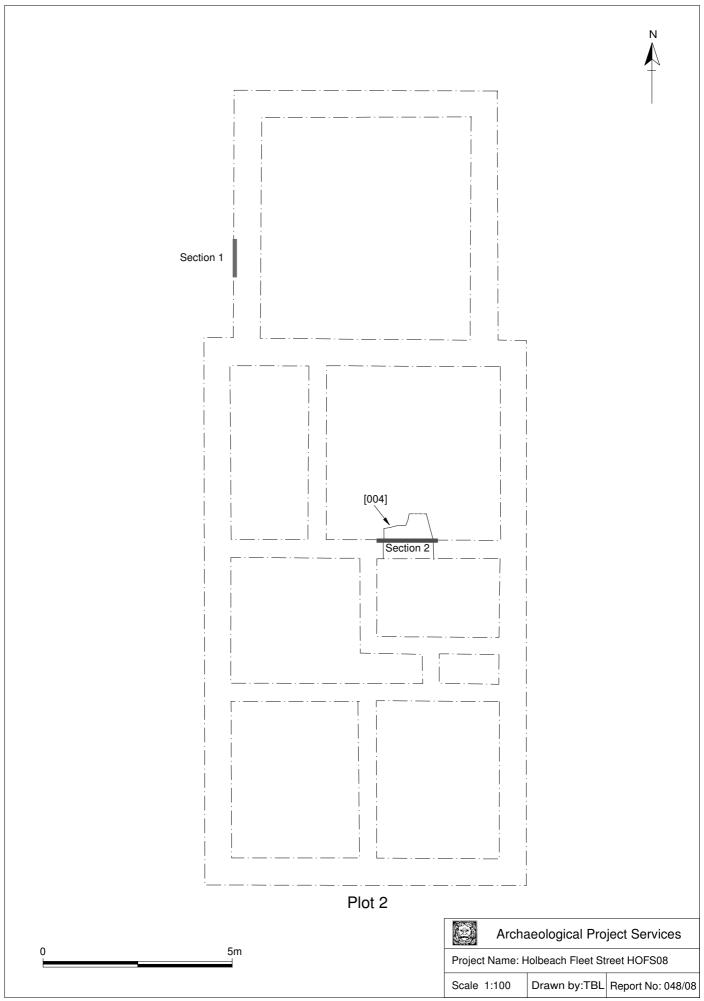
Plan of Plot 2 footings showing location of Sections 1 and 2
